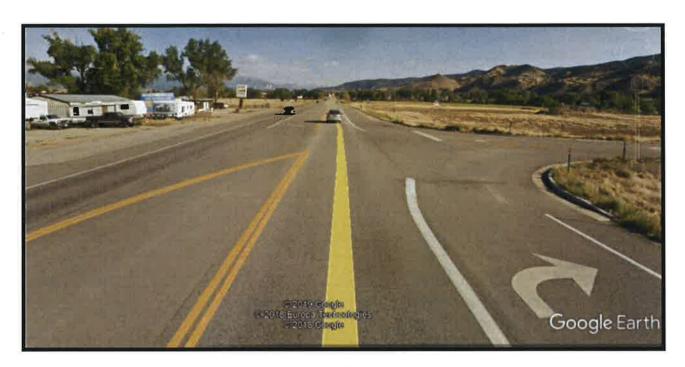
Highway 50 looking North West at Vandaveer Ranch Road
